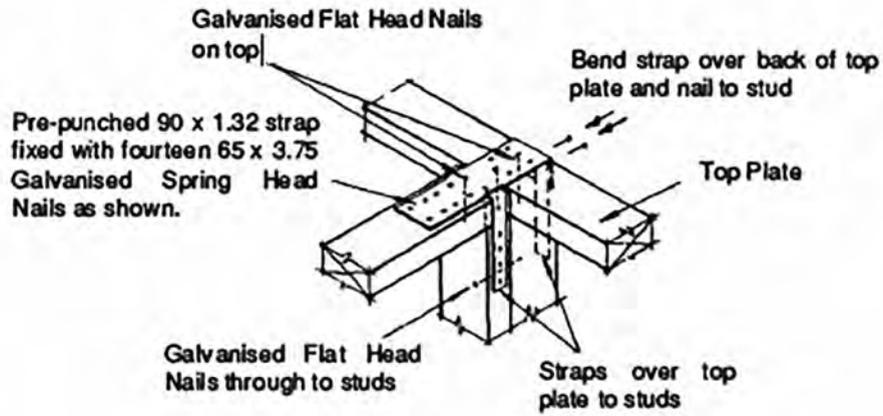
WALL INTERSECTION IN TOP PLATES
